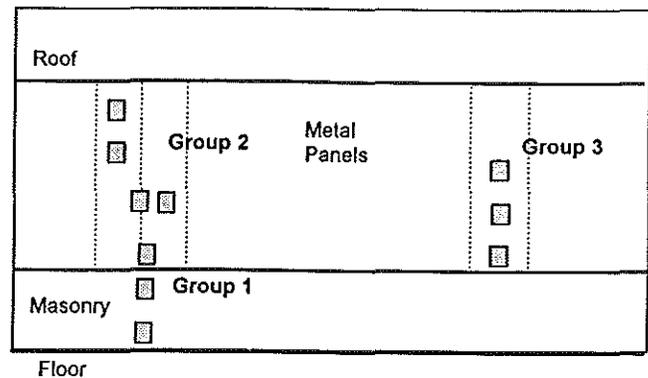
Location of sensor sites at the Riverdale, ND, building. (Not to scale.)
